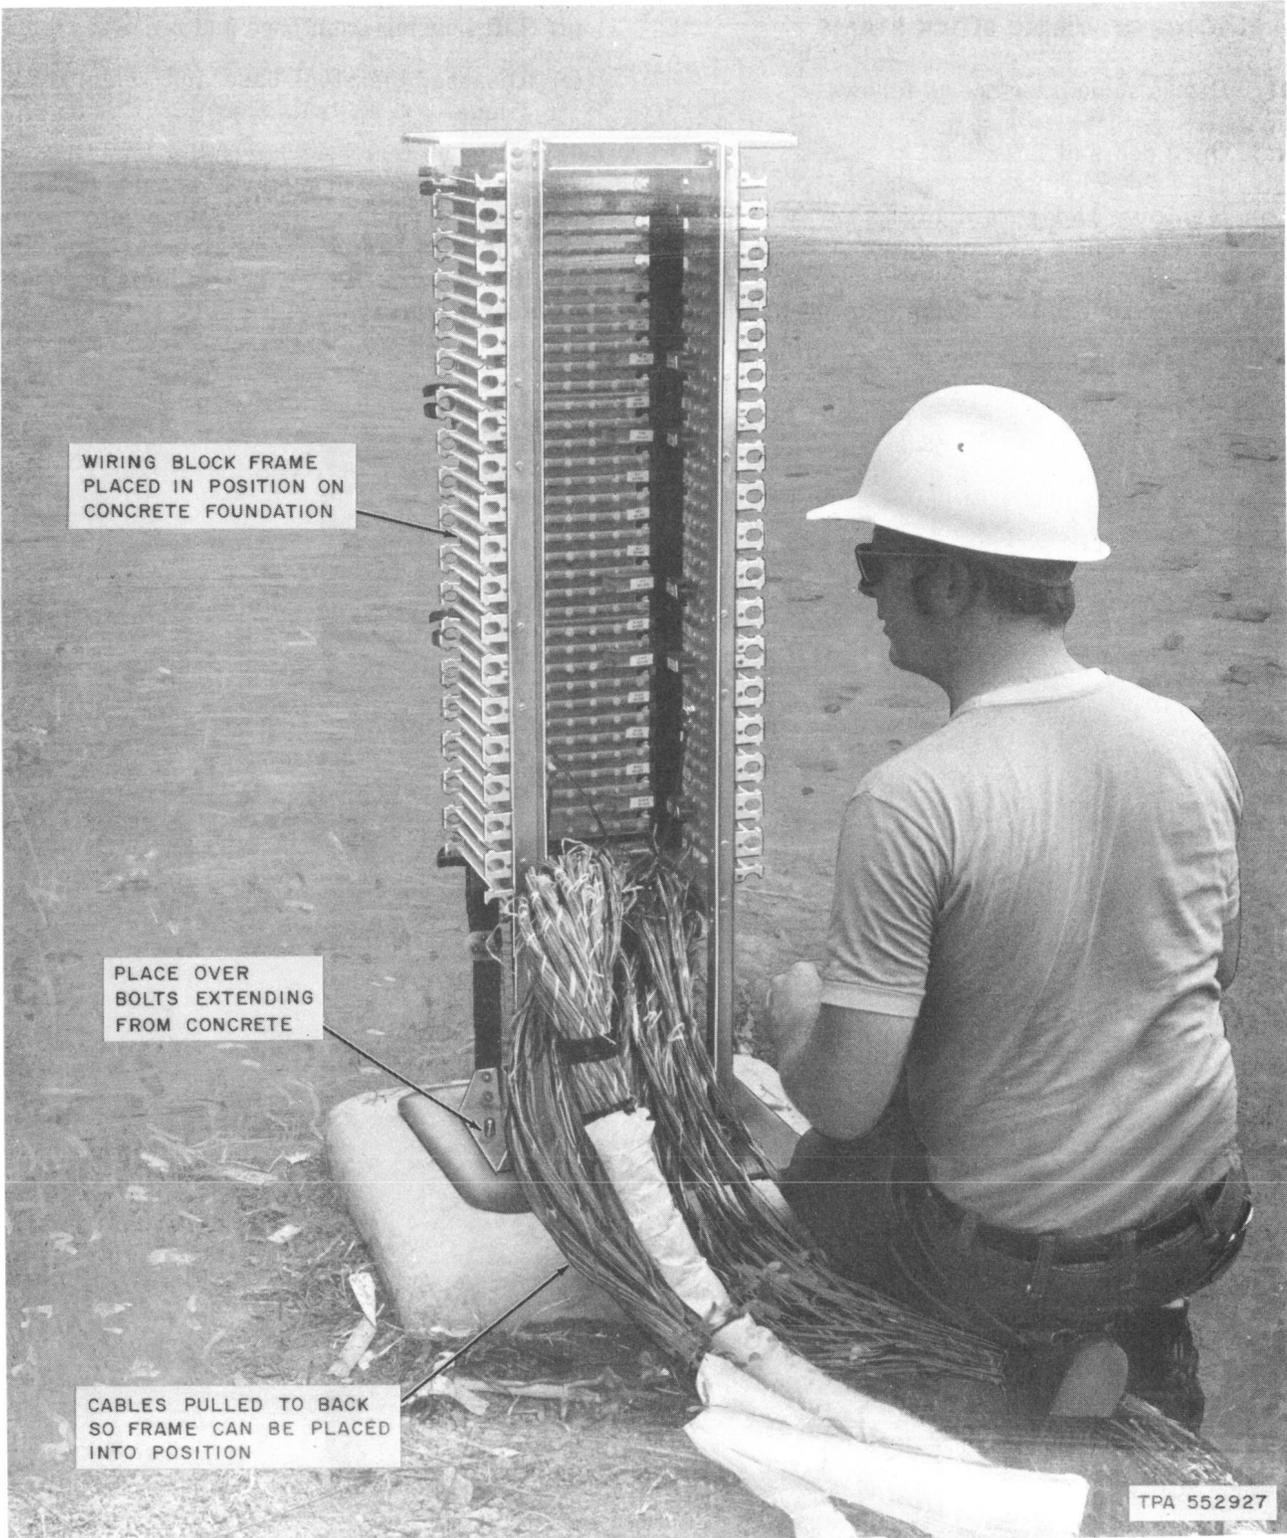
Wiring Block Frame Placed in Position on Concrete Foundation
